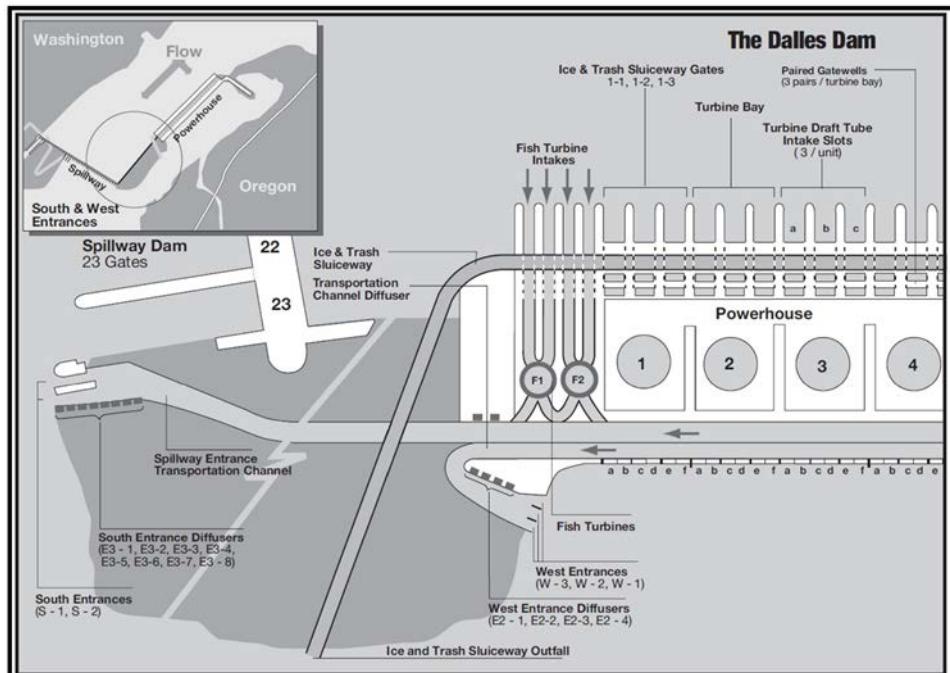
The Dalles Dam South and West Fish Entrances for the East Fish Ladder
